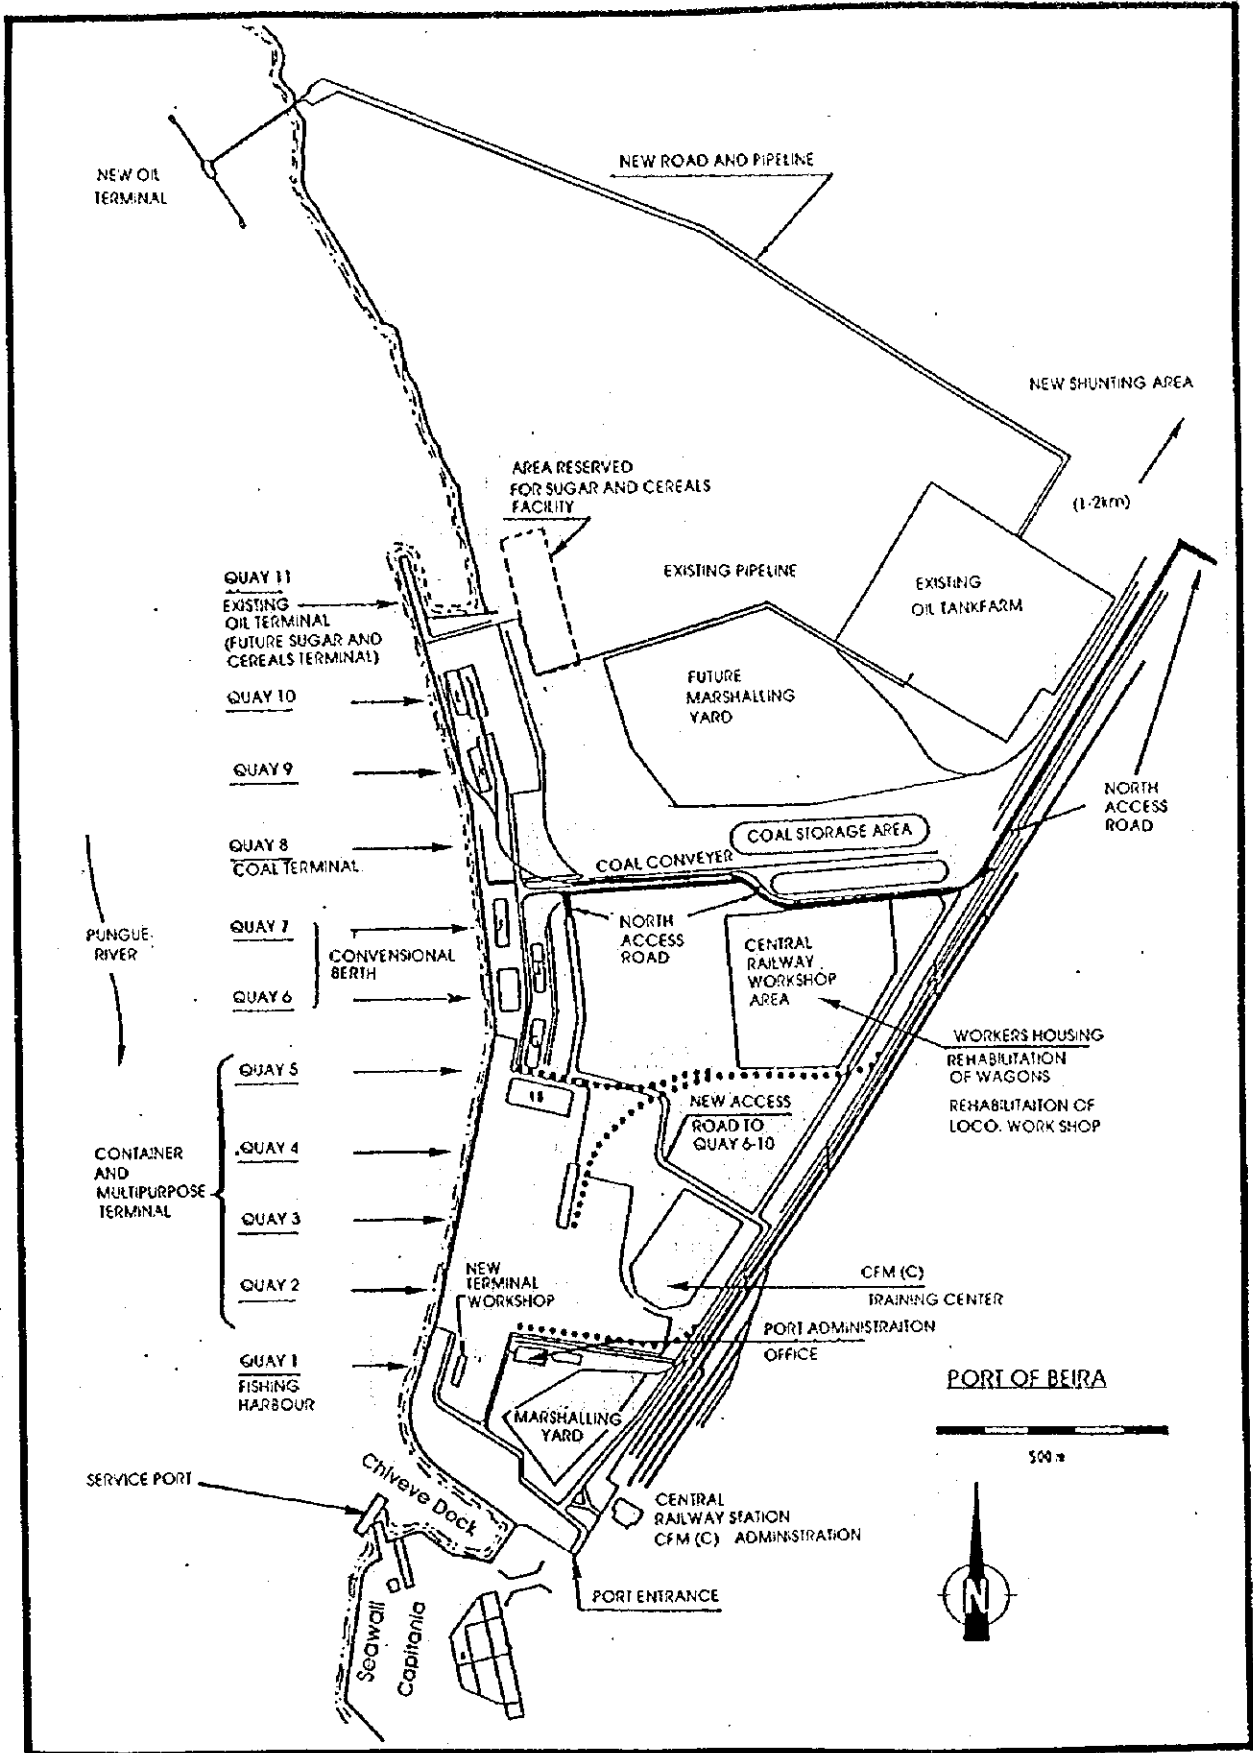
Outline of Existing Port Facility of Beira Port
